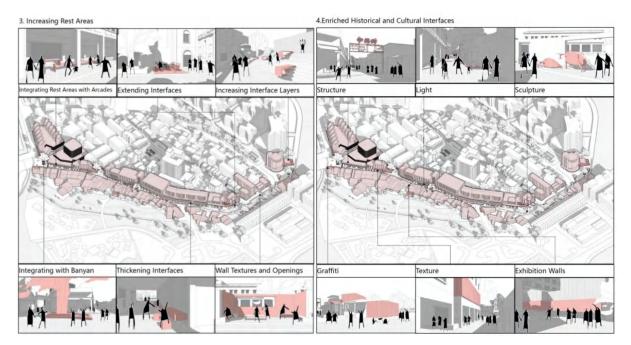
Commercial Street Design (Source: Drawn by the Author)
